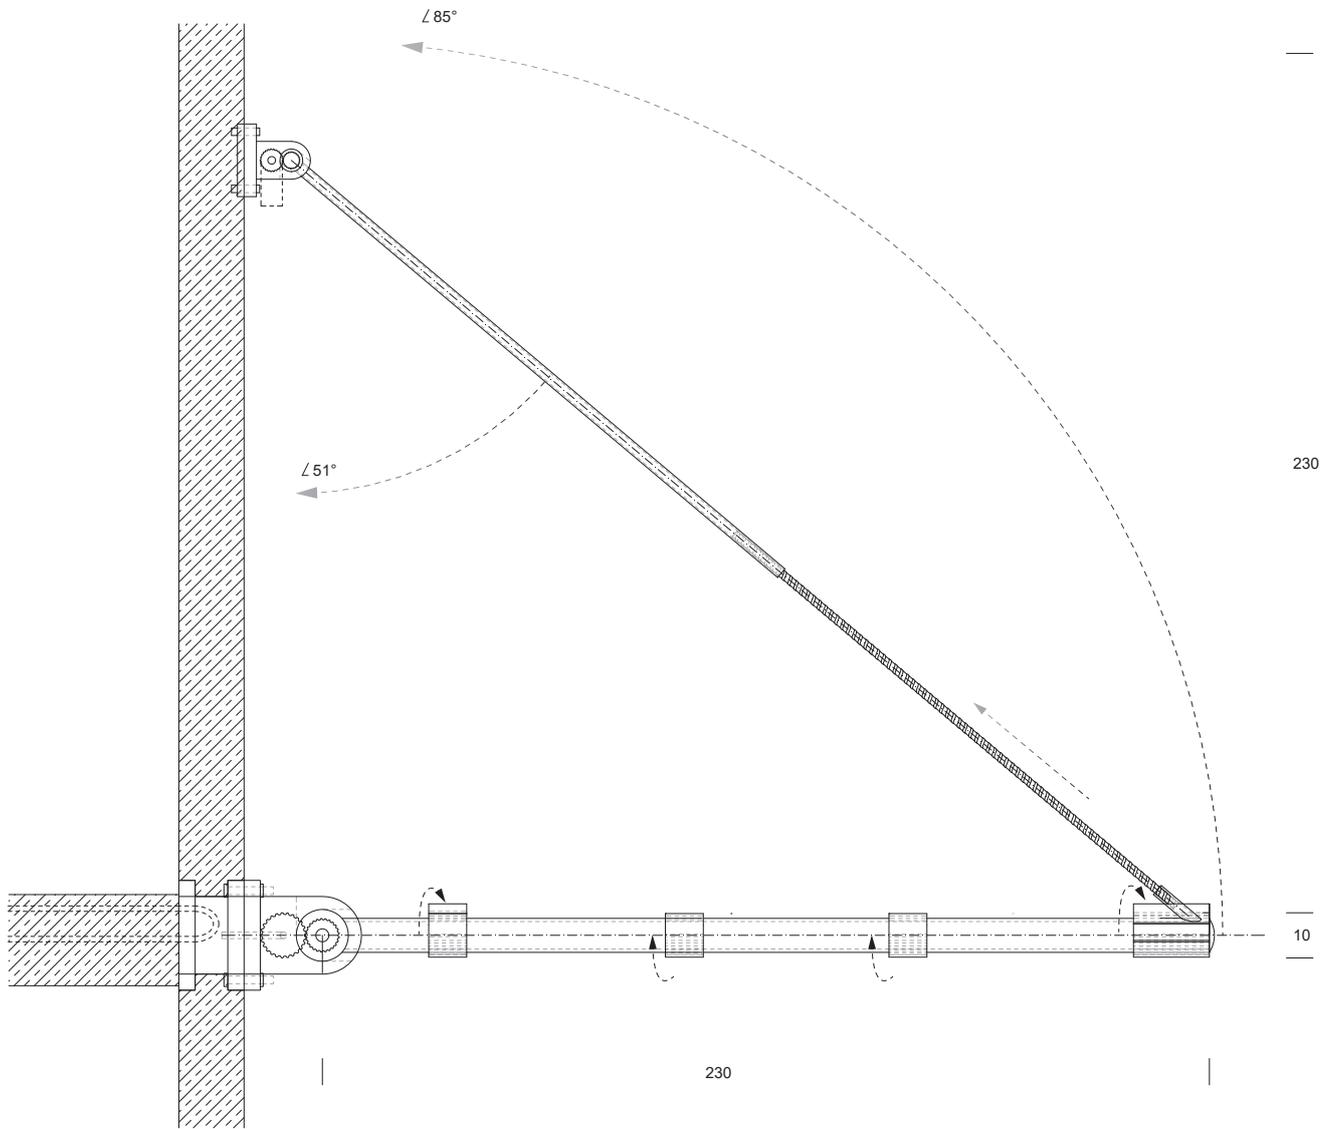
b) Swinging beam I retractable wind bracing element - section - movement overlay
